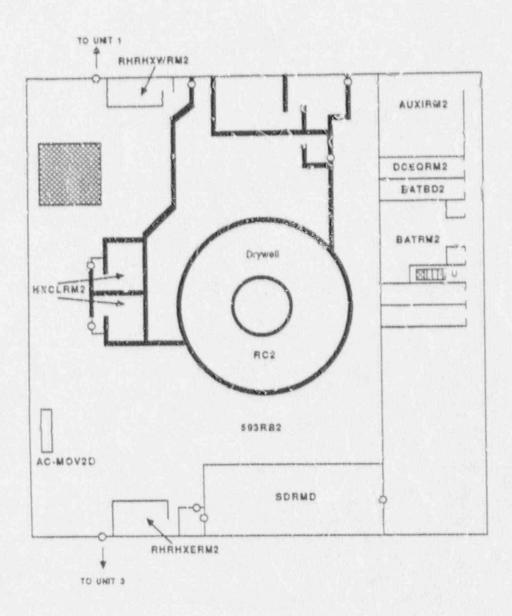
Browns Ferry Unit 2 Reactor Building - 593 ft. Elevation.
